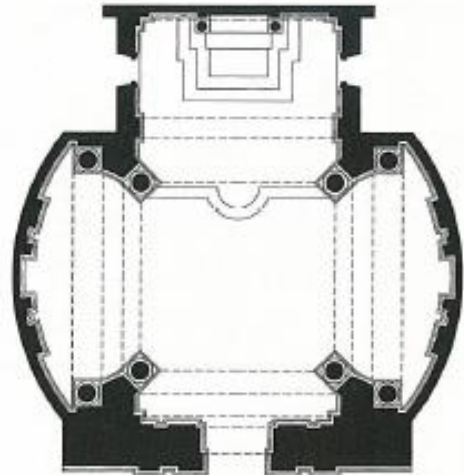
Michelangelo, Sforza Chapel floor plan, Rome, 1561
